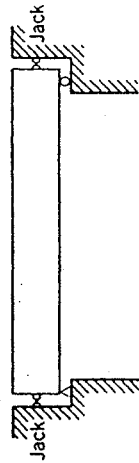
Prestressing a simple concrete beam by jacking against abutments.
